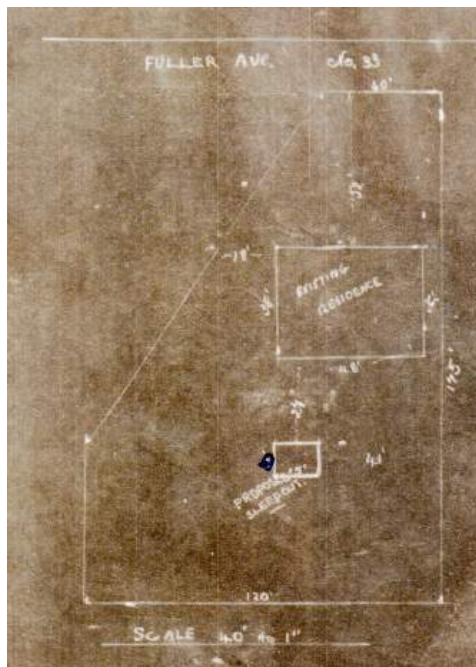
Undated plan showing the location of the sleepout constructed during Angwin's occupation (1941-1958) (City of Boroondara Building Plans 17752).
